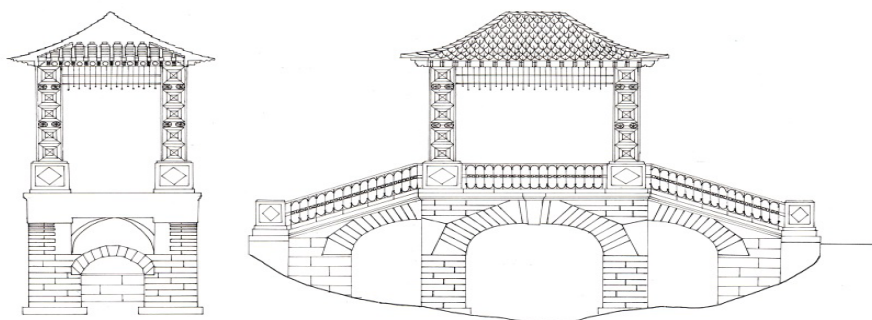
Chinese bridge with a gazebo in Oleksandriia Park in Bila Tserkva (cross-section and façade). Drawings by Peng Chang, 2020.
